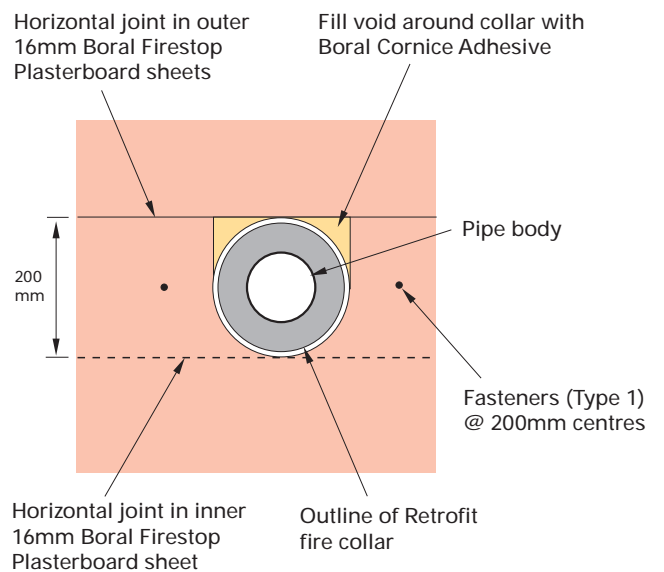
A. Typical plasterboard installation around existing Pipe & Collar FRL NA/90/60
